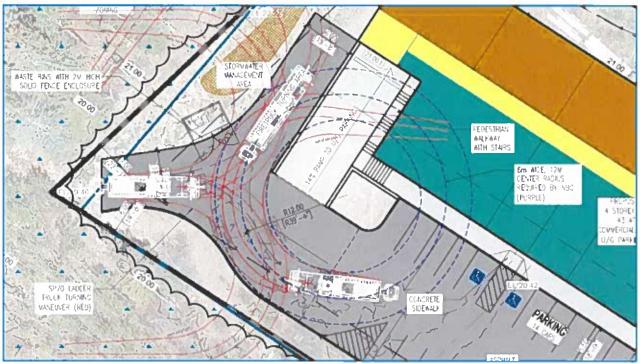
Revised Site plan with Turning Area for Fire Trucks
